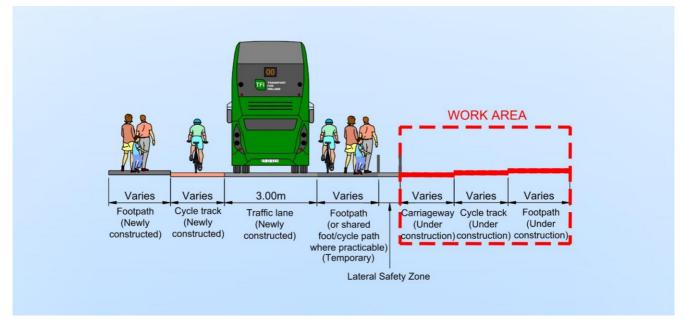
Traffic Management Cross Section, Section 5a – Stage 2
